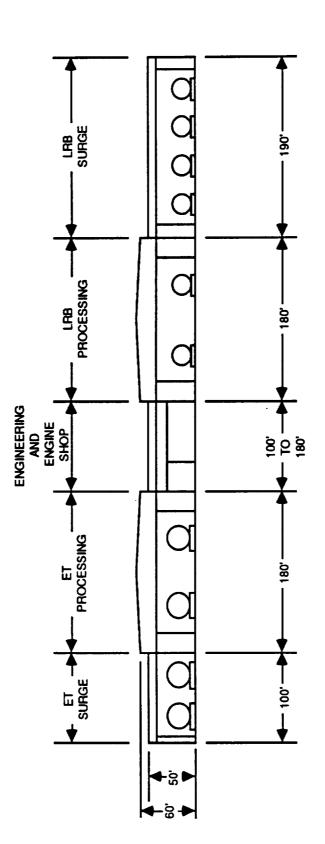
ET/LRB Horizontal Processing Facility Elevation.
